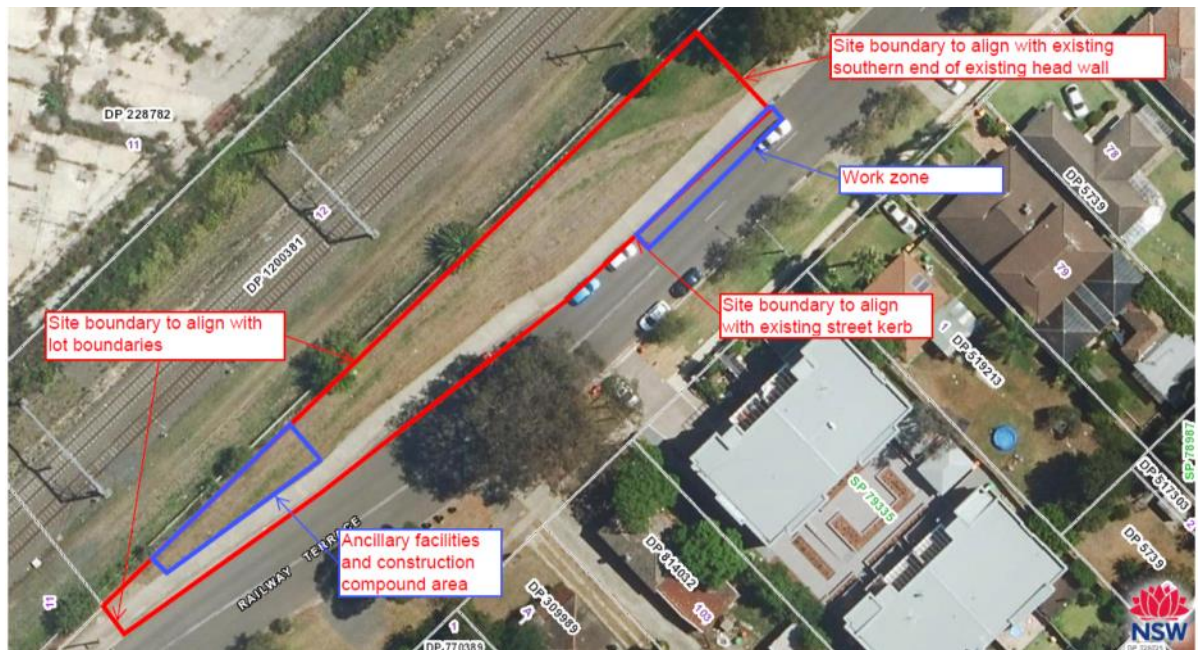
Site 2 Construction Site Footprint, showing indicative location of the site compound and works zone (TfNSW, 2016)
